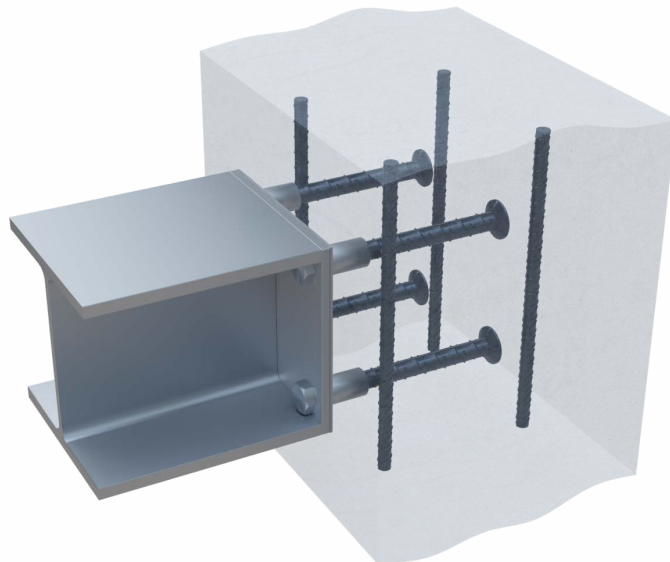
Connection of steel beam to THRELDA® Anchor Plate.
